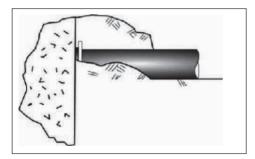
Connection to Rigid Structure Using Consolidated Earthen Berm
